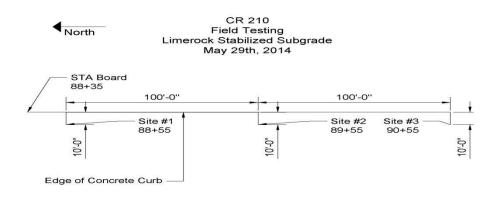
Project Site #4 CR-210 - Test location sketch
